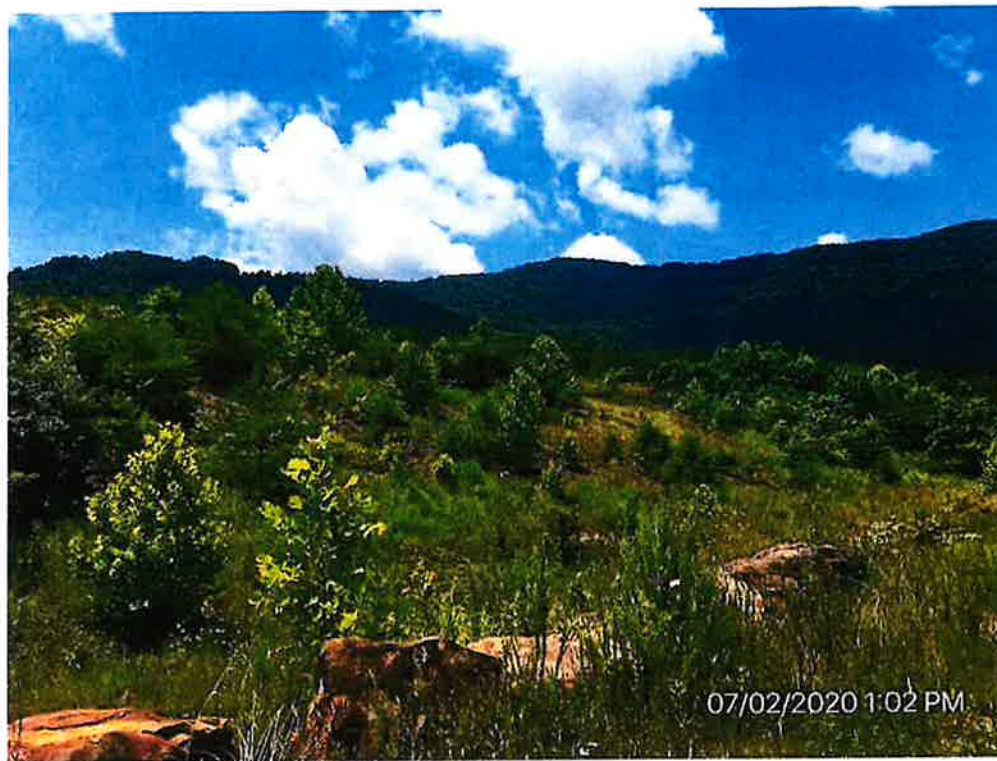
Premium Refuse Area 2. Bare areas on storage area must be vegetated or otherwise stabilized. 7/2/2020.
